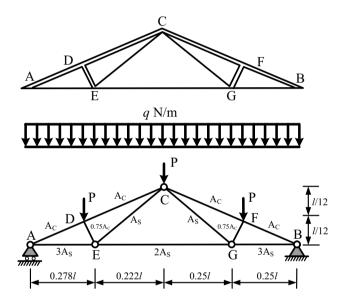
Loads, reinforced concrete and steel bares of the roof truss for example 2
